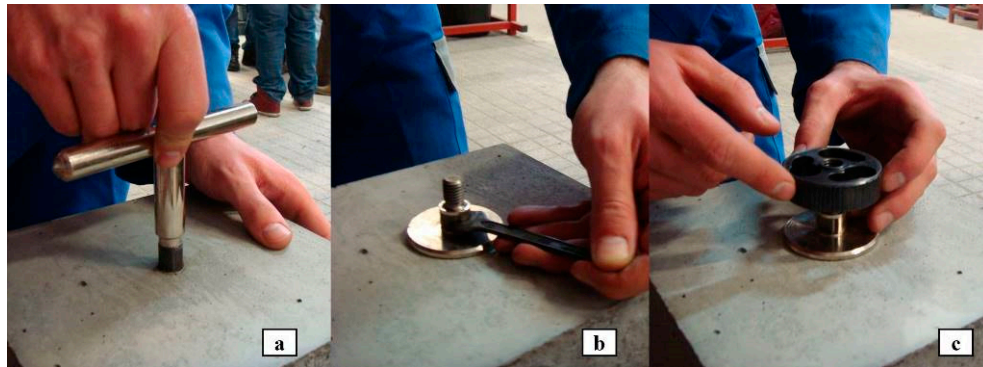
Pull-out test: (a) removal of the stem, (b) screw of pull-bolt flange (c) screw of coupling.
